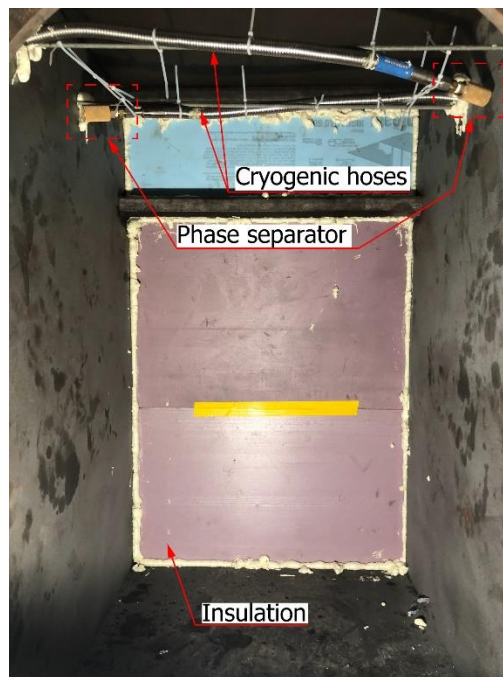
Baseline Specimen: cooling equipment inside the box section
